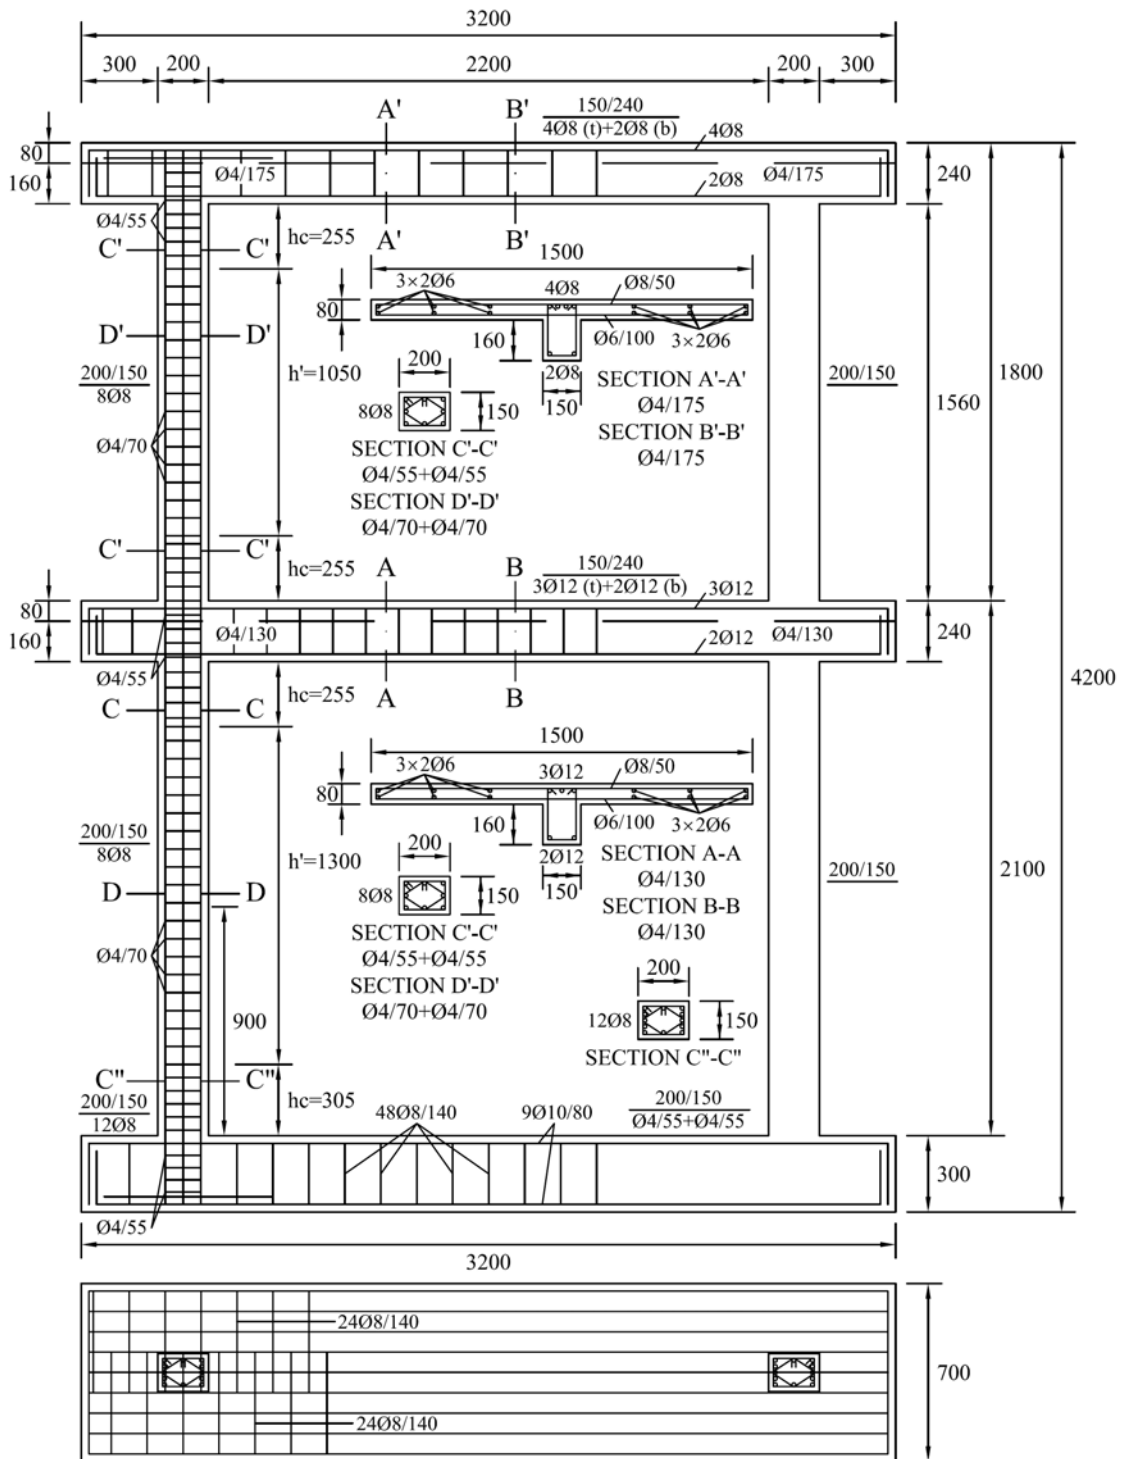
Geometry and reinforcement detailing of the tested frame (Carydis, 1997).
